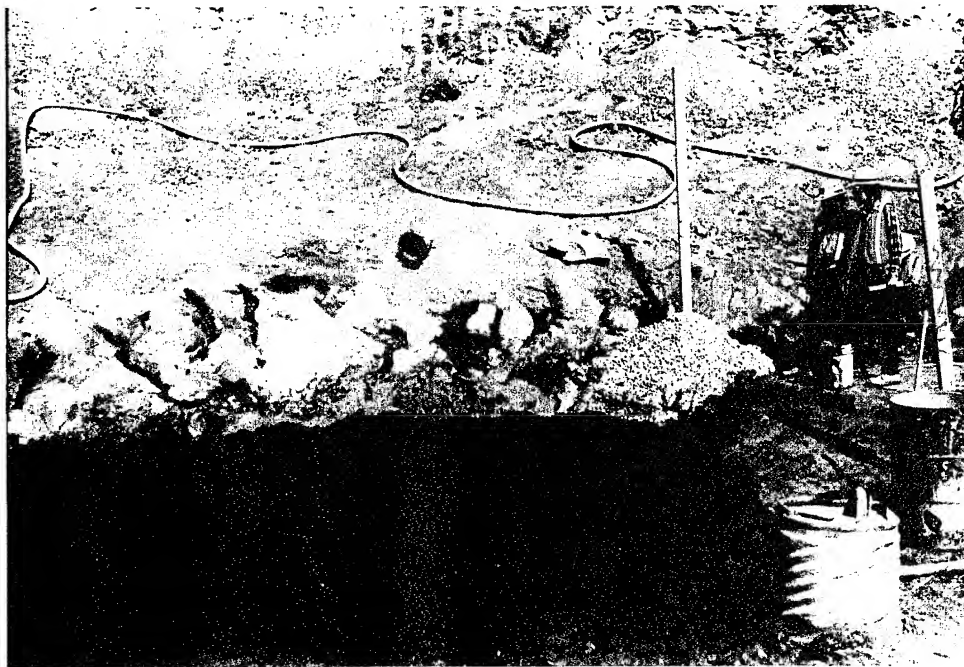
Area in previous photo after placing slush grout over an area of about 4-feet by 10-feet.
